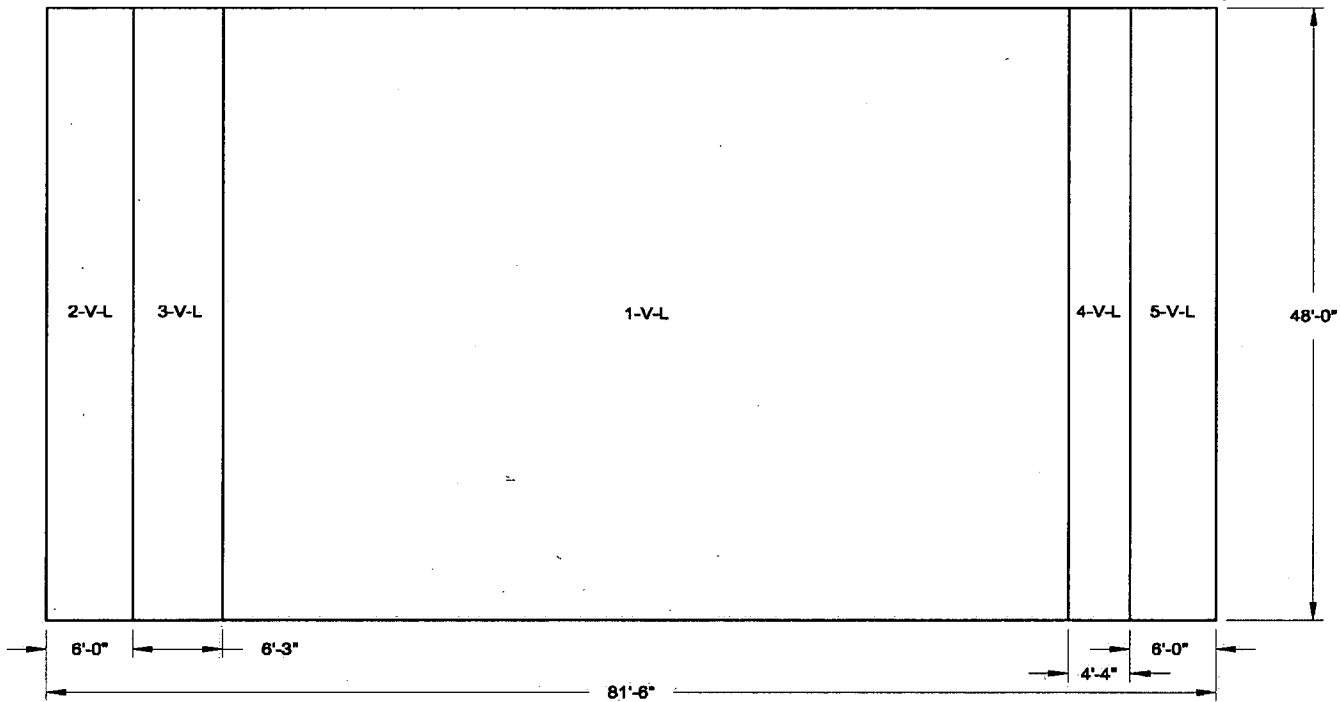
H.6-143: SLAB 1 LOOKING DOWN
